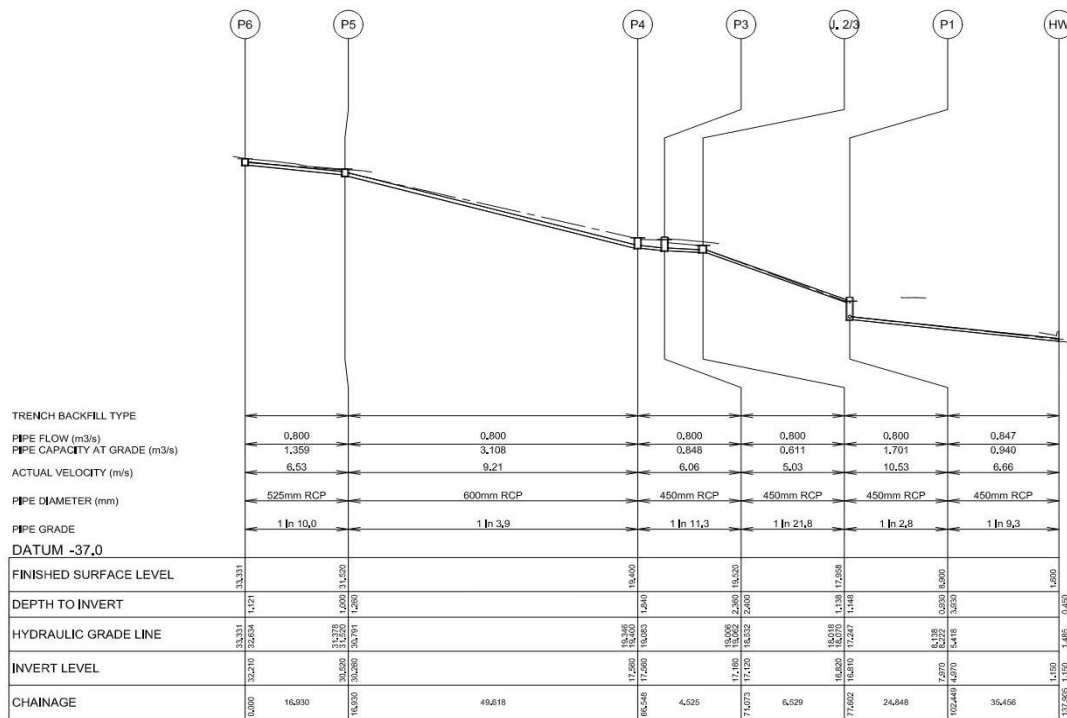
Stormwater outfall drain long-section model for a 5yr ARI existing conditions flow. Not to scale.
